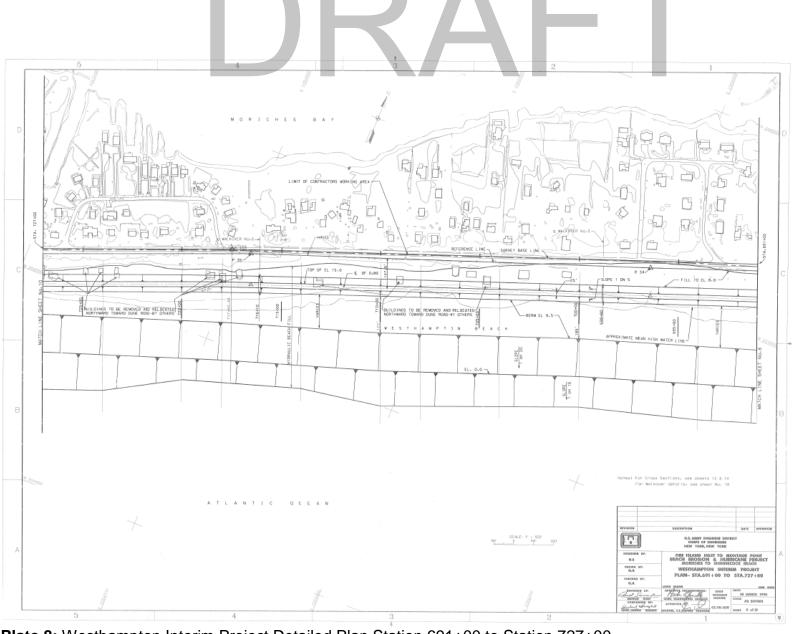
Westhampton Interim Project Detailed Plan Station 691+00 to Station 727+00
